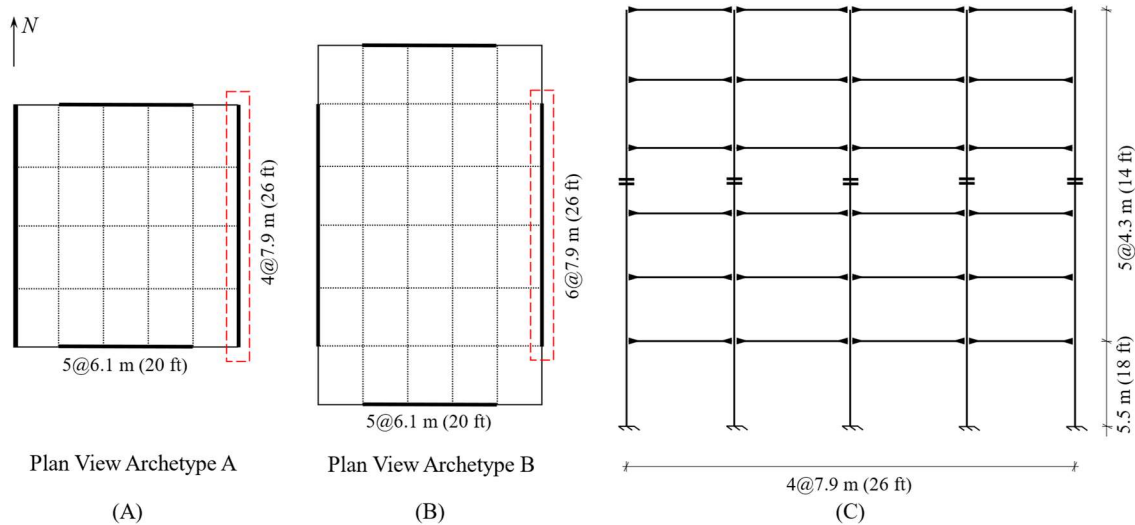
Archetype building scheme: (A) Plan view specimen A, (B) Plan view specimen B, (C) Elevation for both archetype buildings A and B.
